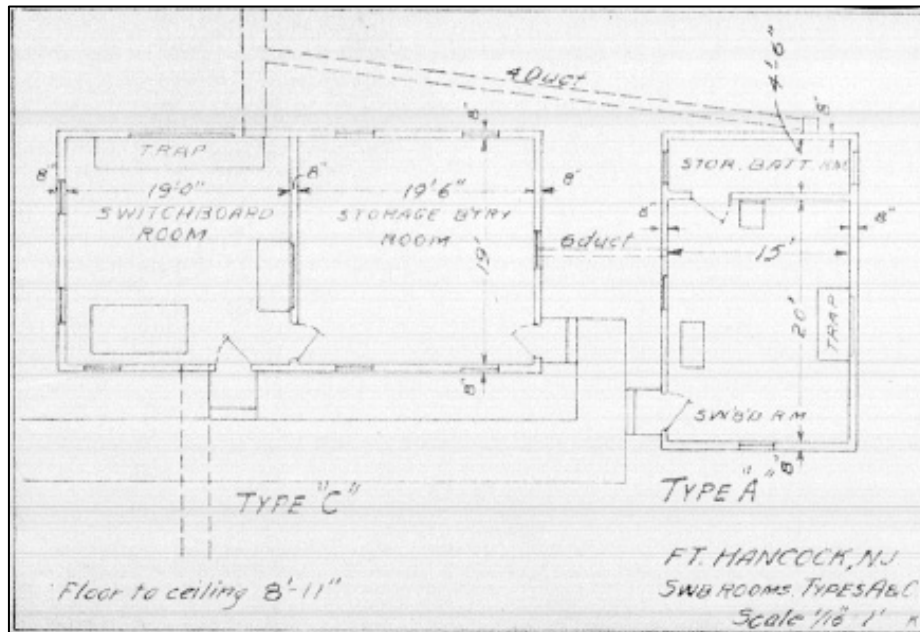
Plan of switchboard rooms Type “A” and Type “C,” constructed on the west side of Battery Potter, July 1, 1921.
